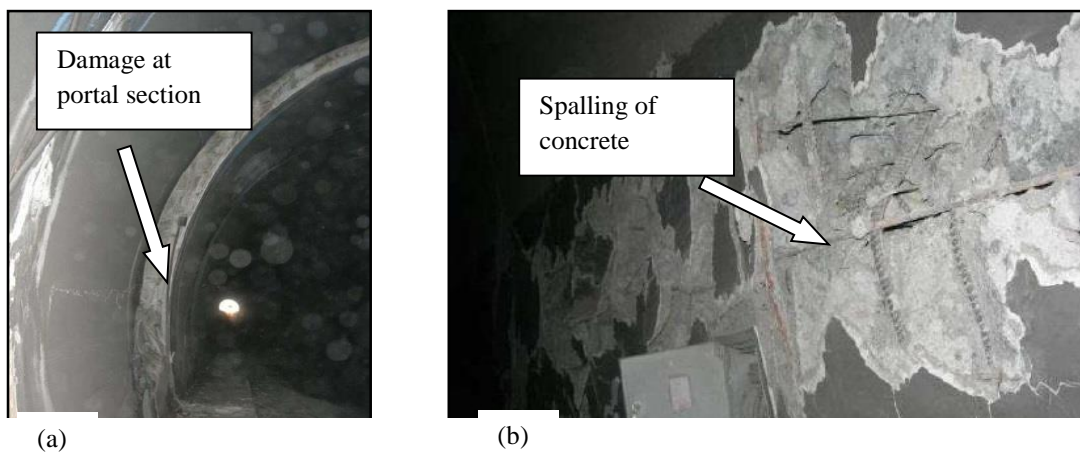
Damages at Baiyunding tunnel (Modified after Tao *et al.* 2011): (a) Portal section damage due to landslide; (b) Sheared off tunnel liner
